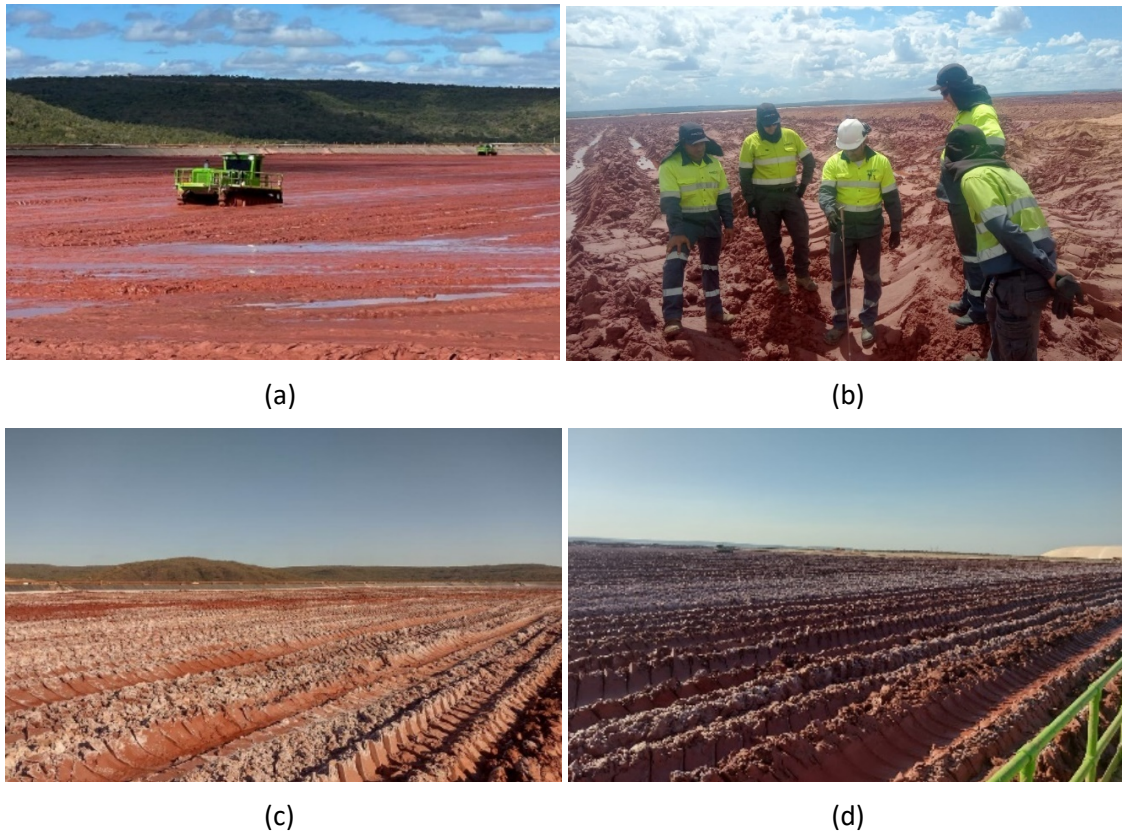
TSF A material strength improvement through AMC cycle. (a) MudMaster working tailings surface providing dewatering; (b) In situ inspection and testing on foot after shear strength is found to be over 40 kPa.; (c) and (d) Pictures during September 2023 with material strength >50 kPa
